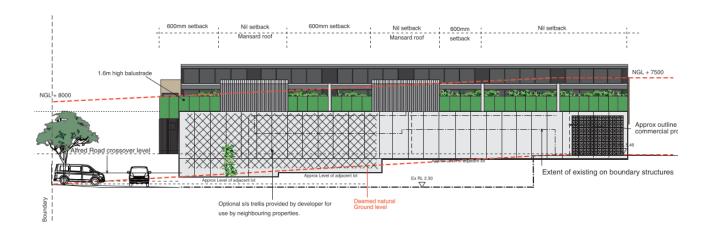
Amended side elevation (north) - Plans dated 19 December 2021
